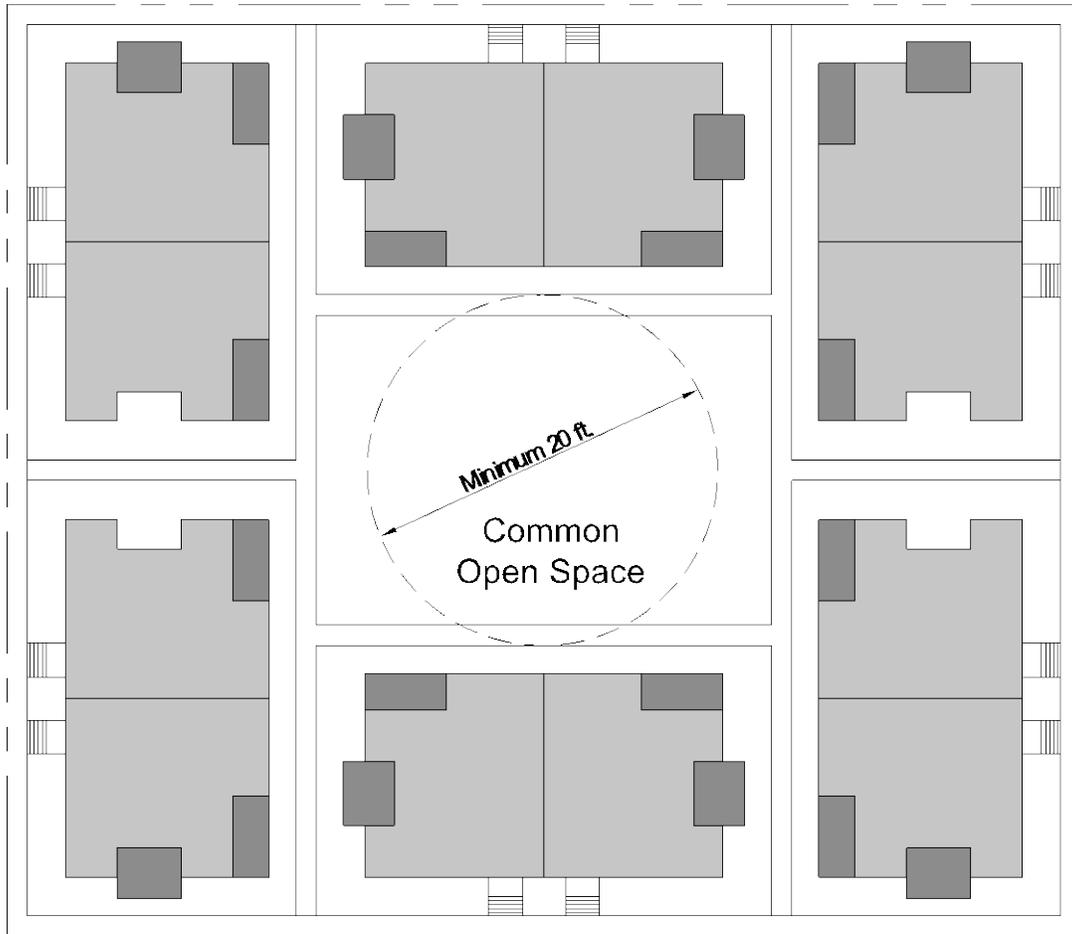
D.1.b: MINIMUM REQUIRED COMMON OPEN SPACE DIMENSION
